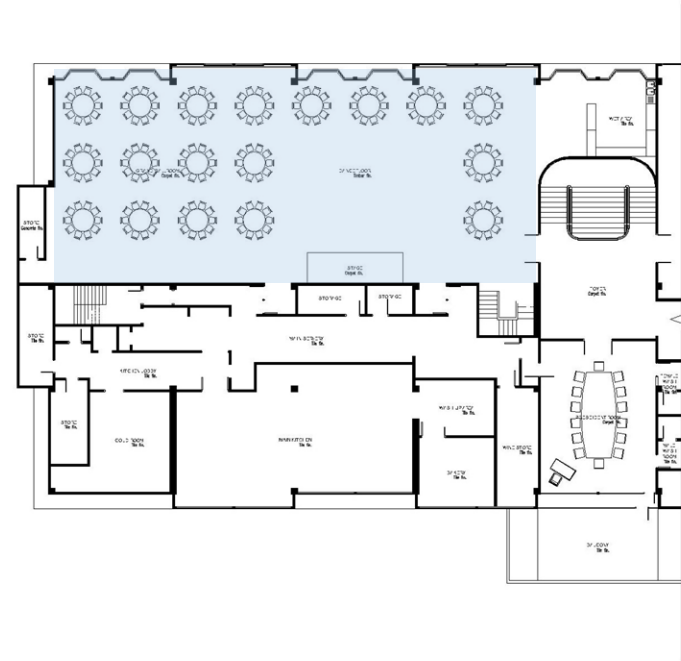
(g) : Image of highlighted first floor plan (Lim,2017)
